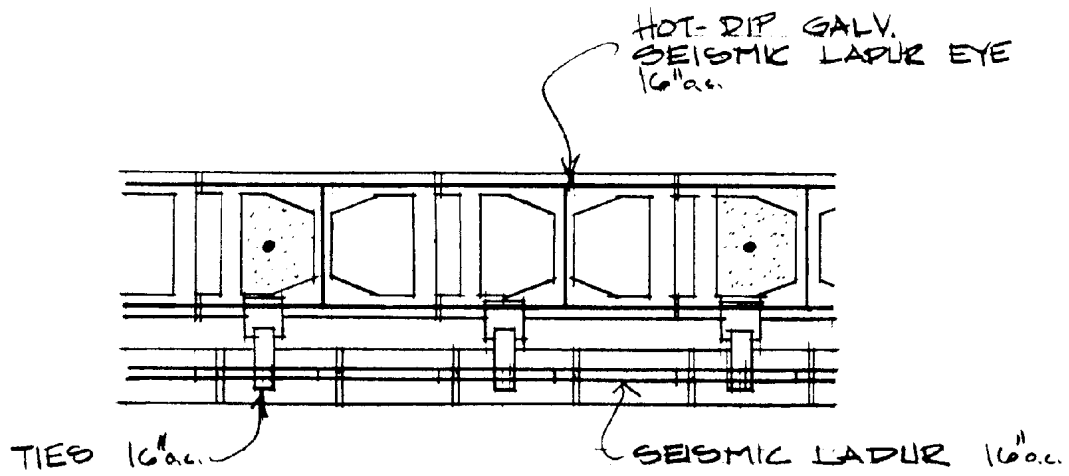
cavity wall ties and joint reinforcing. Ties are required to engage horizontal joint reinforcing in the veneer per BOCA 1992 Supplement 1409.7.1.
